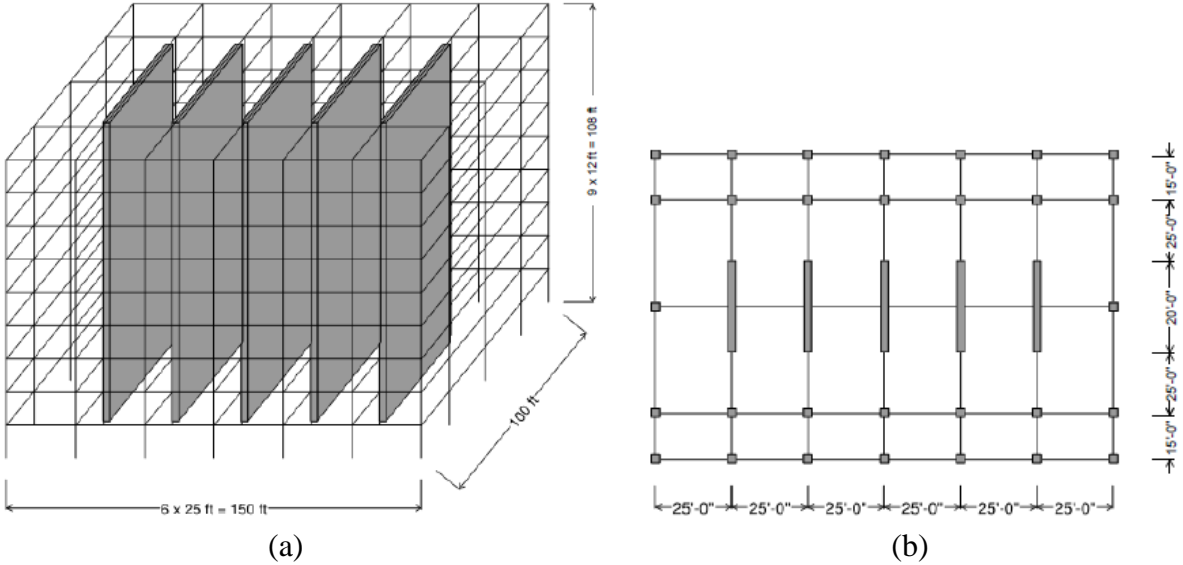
The schematic sketch of the 9-story building: prospective view (a) and plan view (b)
